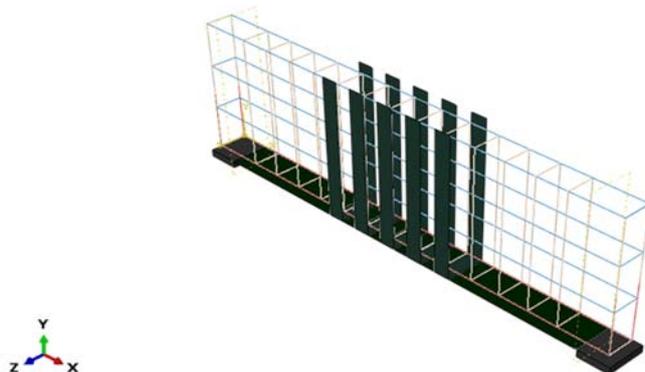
Deep concrete beam (NSC) type DB\_GB\_S\_CFRP
